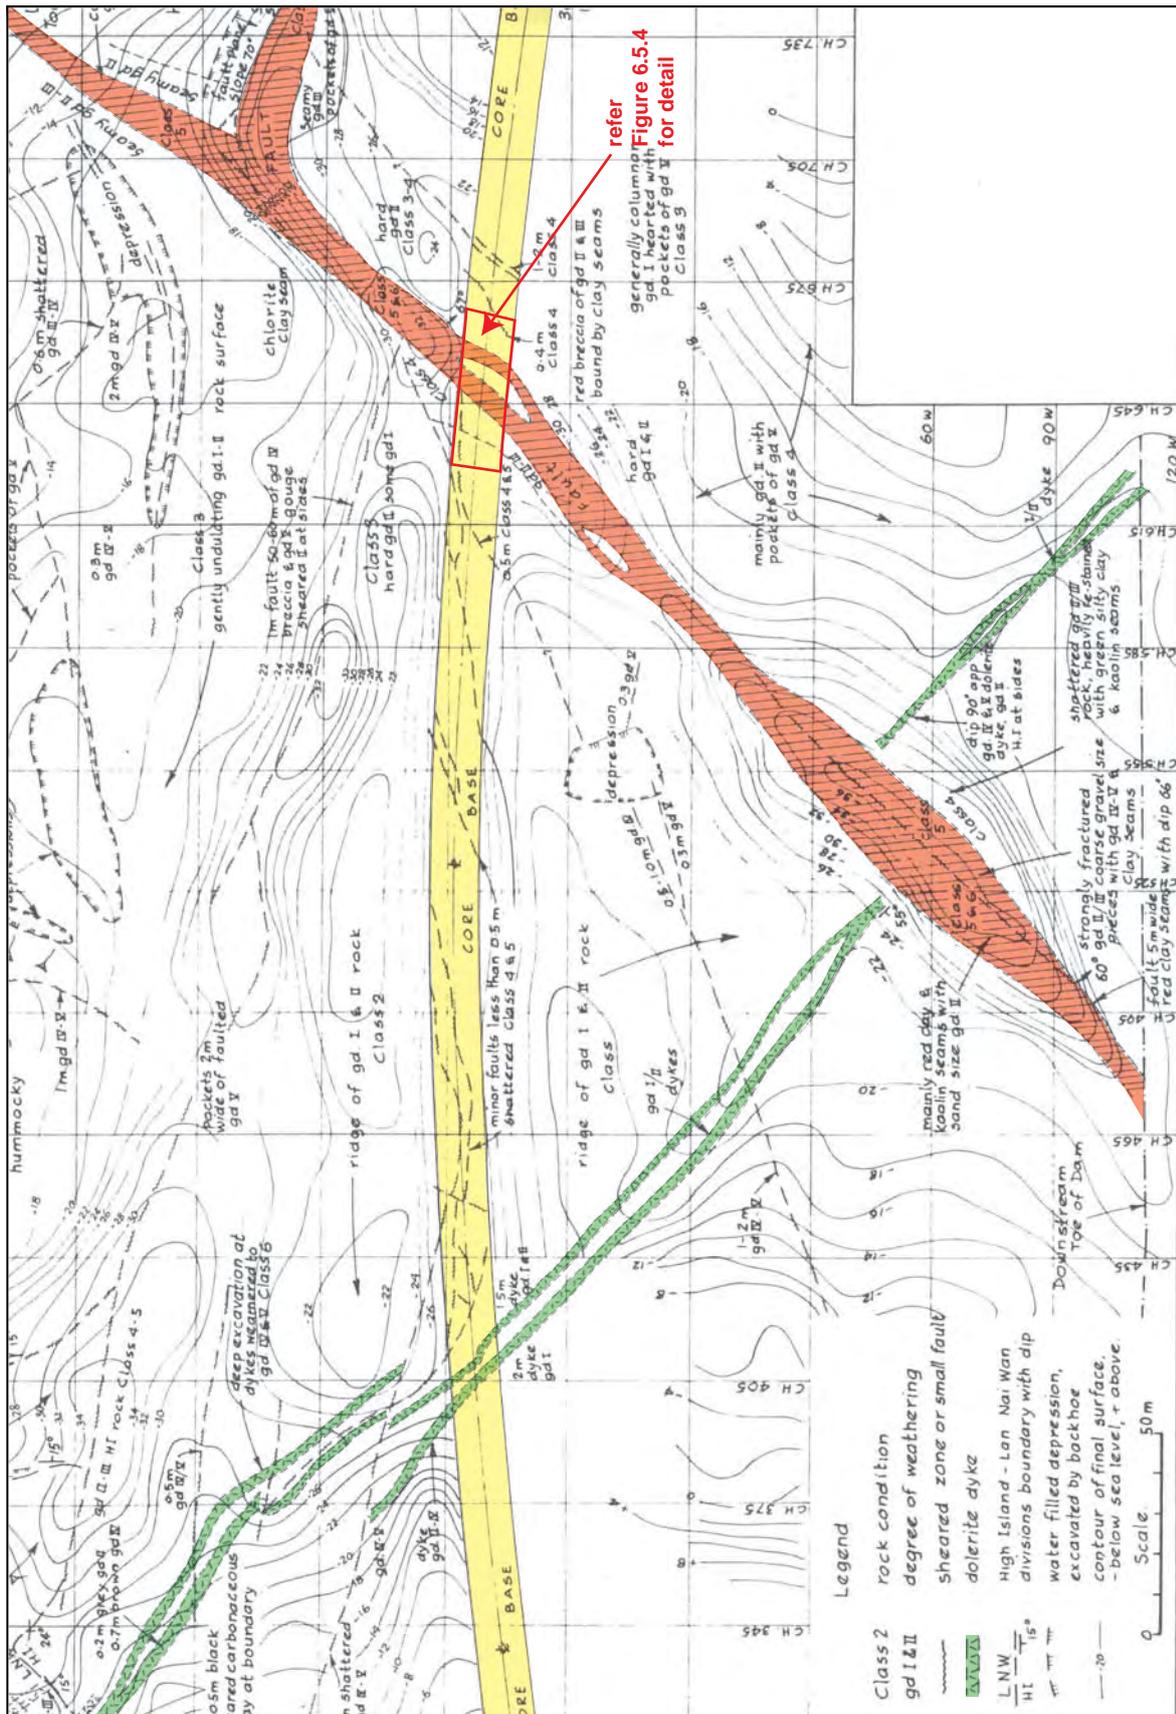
Extract from an engineering geological plan for the West Dam foundation of High Island Reservoir (after Watkins, 1979)
